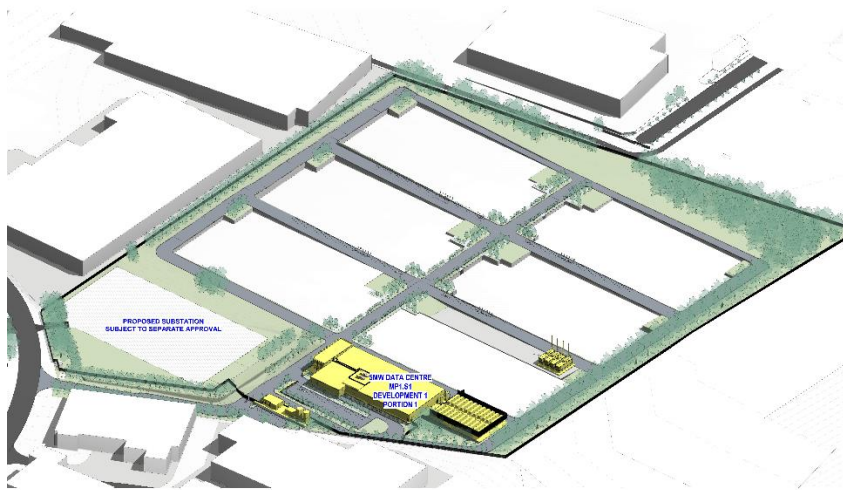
Masterplan Massing – Construction Phasing – Stage 1
